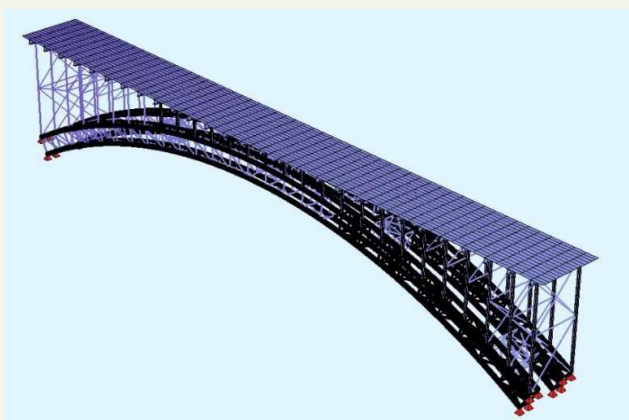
Deck arched truss road bridge [224 m] (Dimitrios Platanas, 2024)
